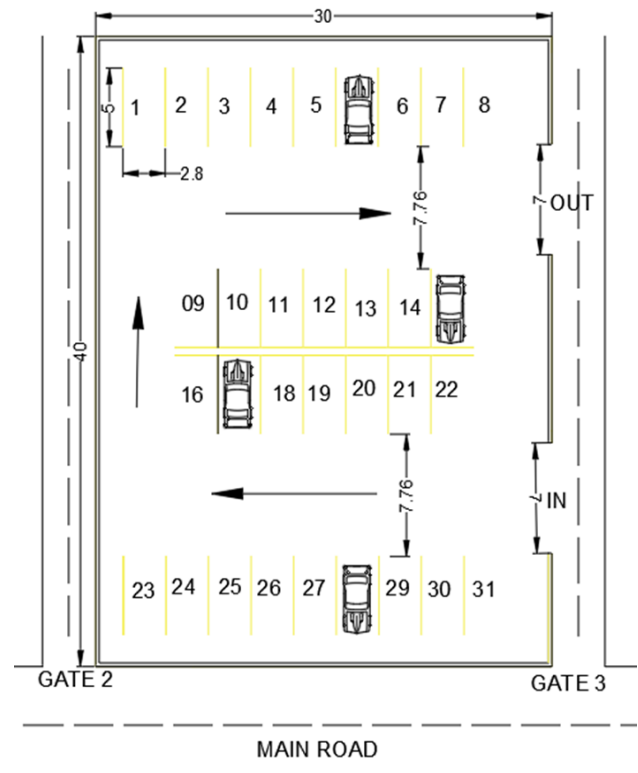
Planning of multistory parking in AUTOCAD (Ground Floor).
